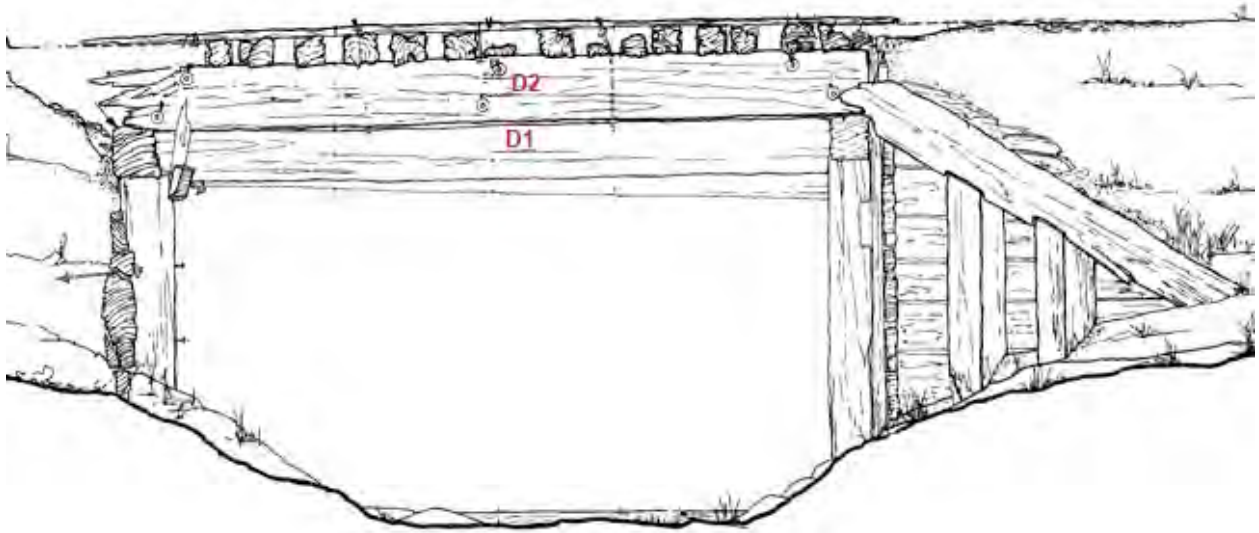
Trestle #1, North Elevation, with resistance drilling locations (red).
